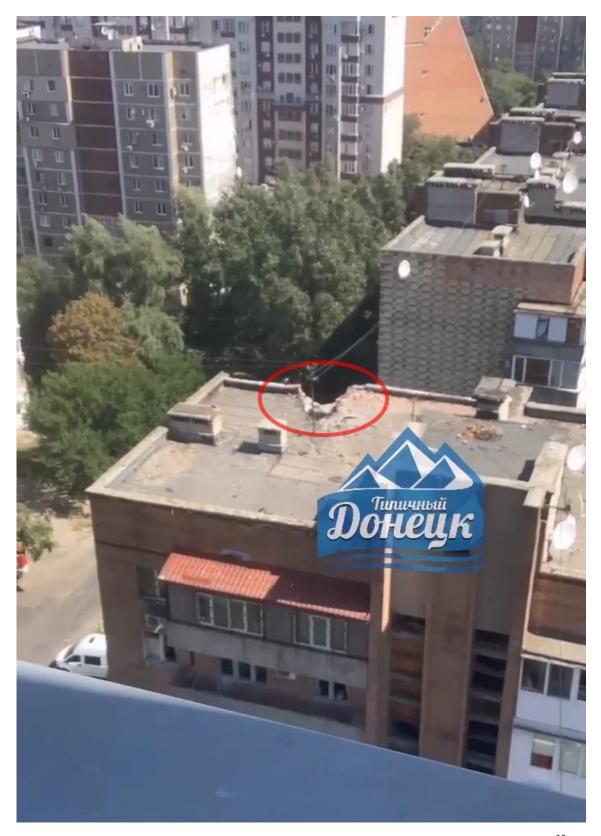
Destruction of the upper floor of the residential building at 7B Pushkina Blvd.
